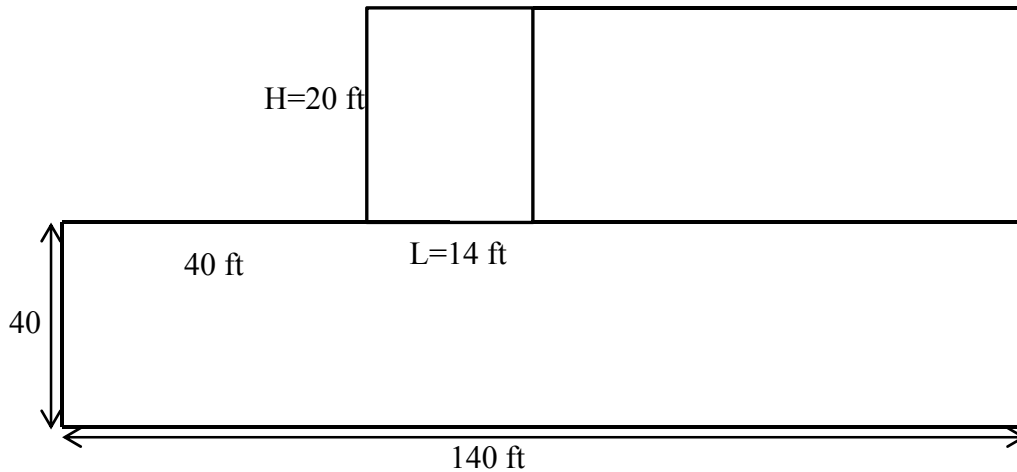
MSE Wall with 20 ft Wall Height and No Back Slope Model Geometry for FLAC.
